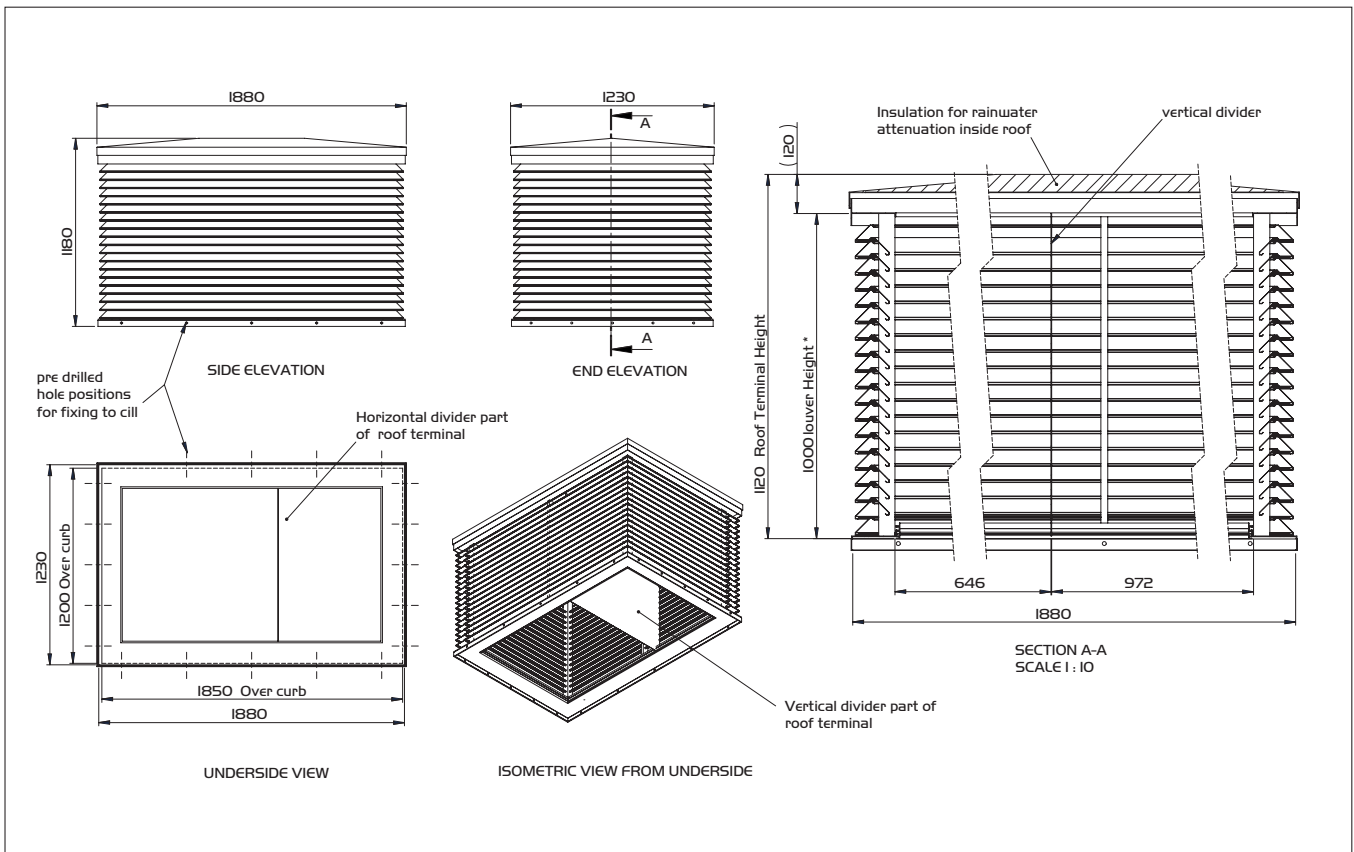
Typical installation example of e-stack S-Series roof terminal.
